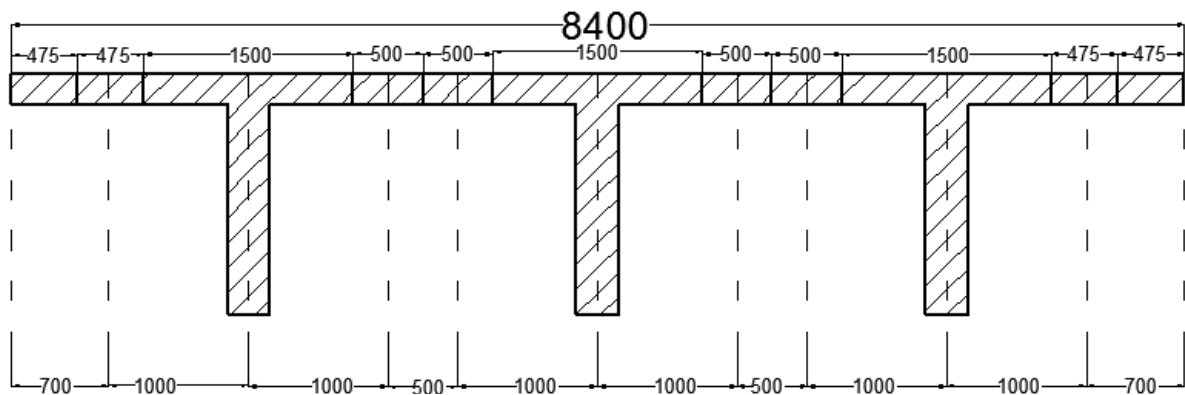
Typical Grillage idealization in longitudinal direction (All dimensions in mm)
